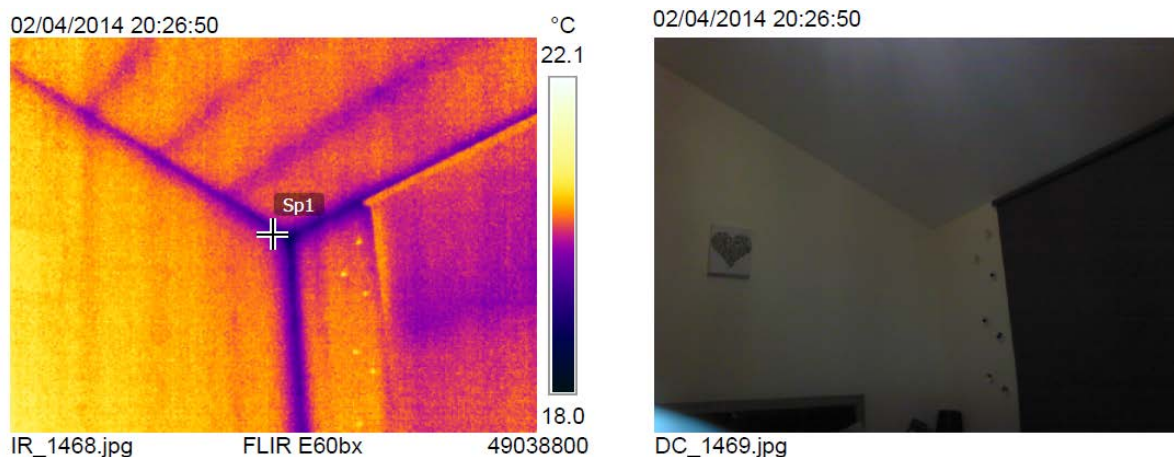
10: Thermal image of wall under test, highlighting location of repeating thermal bridge roof and to some extent walls. An additional layer of insulation over the studs and joists would have reduced this.
